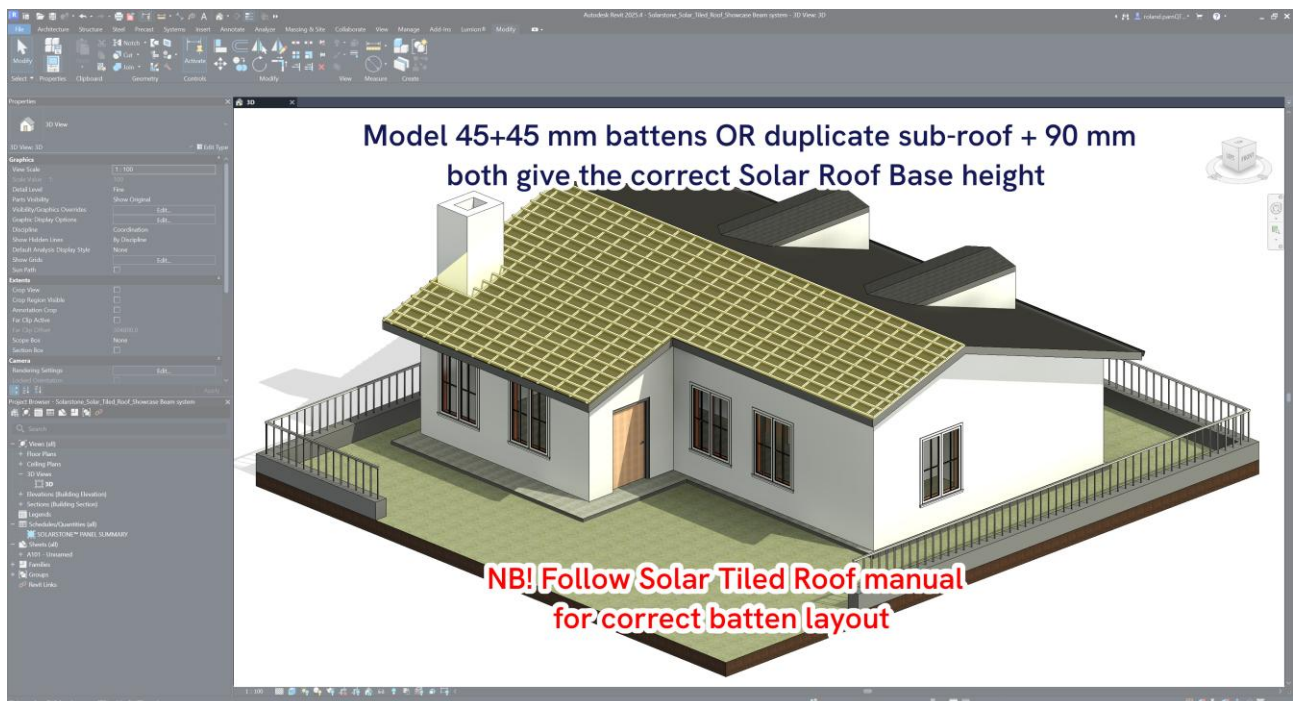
Example of how to set the Solar Roof Base elevation using modeled battens or a +90 mm offset.
